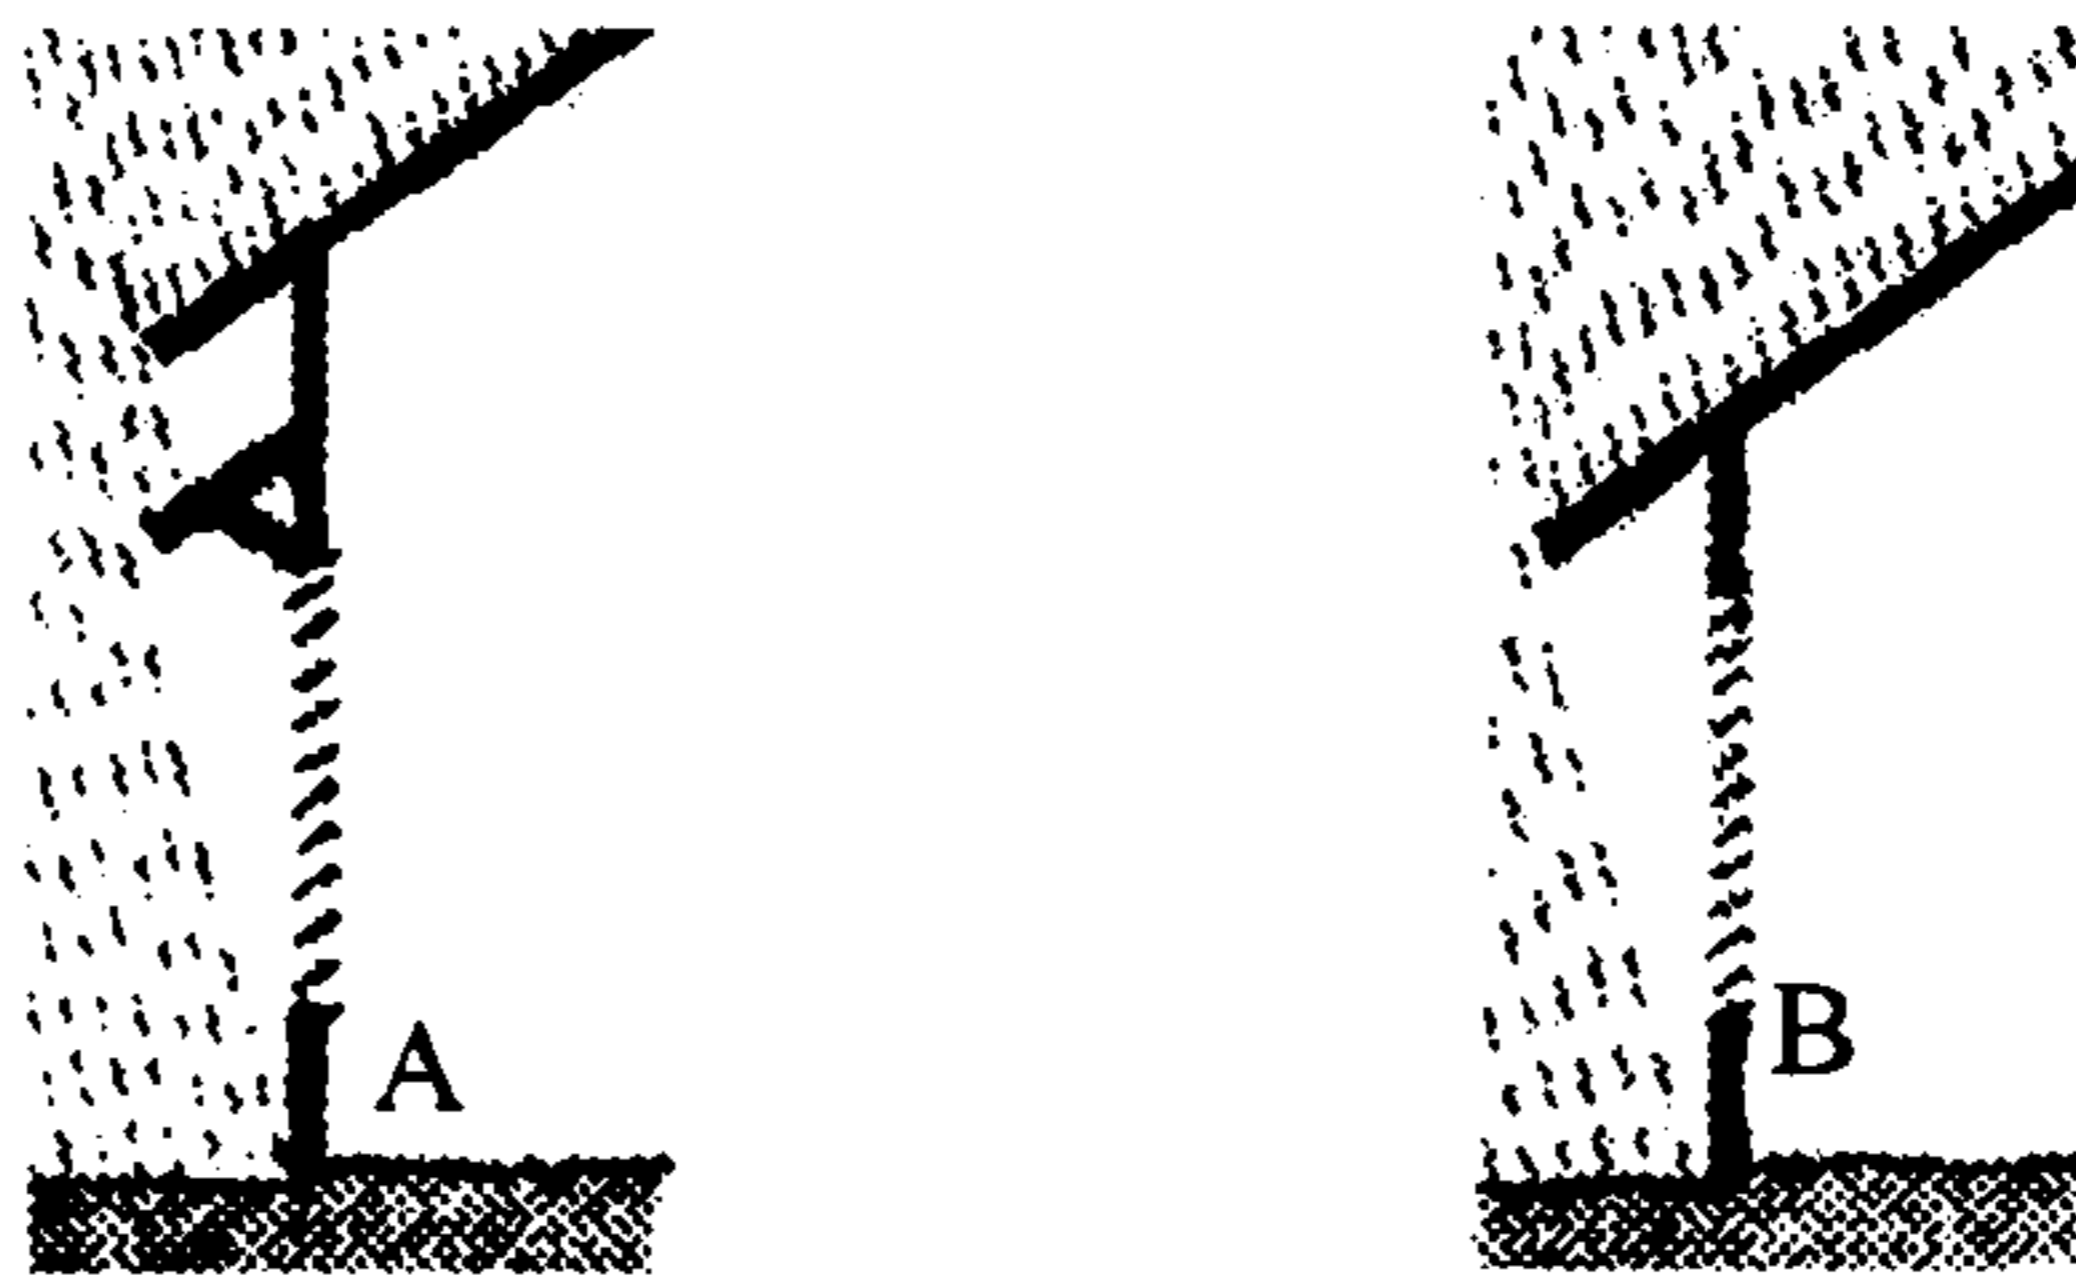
High roofs which need additional sun screens (A) and short roofs which are automatically protect the windows (B).
